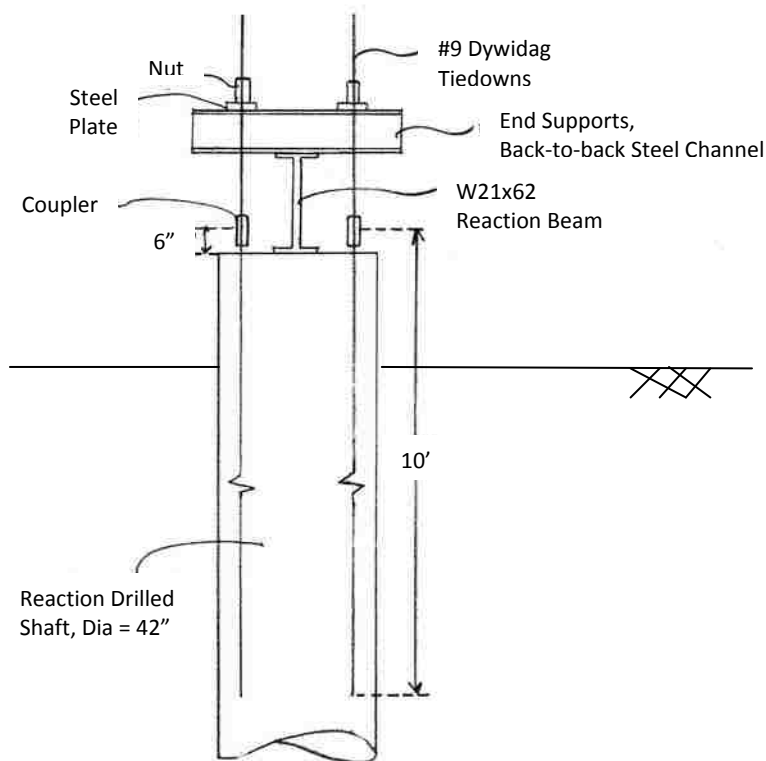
Side Elevation View of WTS Axial Load Frame
